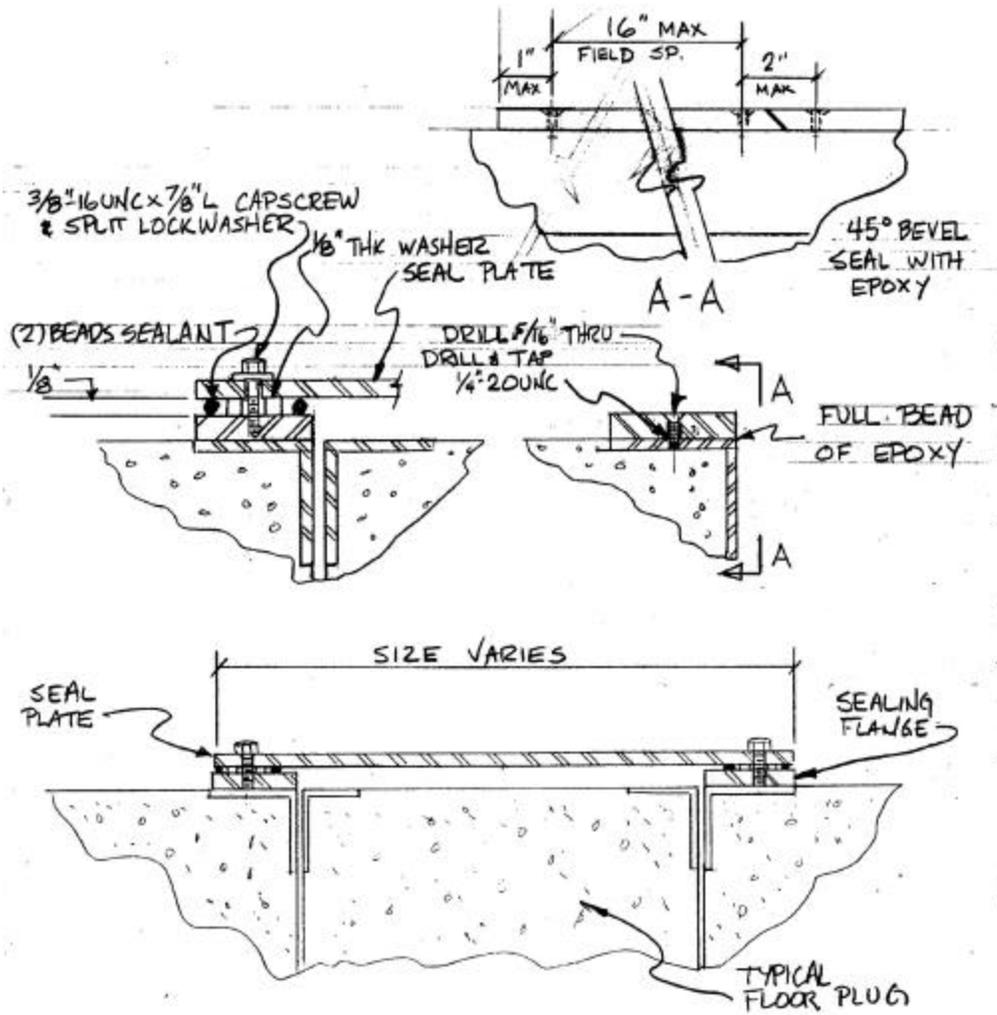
DETAILS-ANIMAL & INSTRUMENT TUNNELS SEAL PLATES & FRAMES
